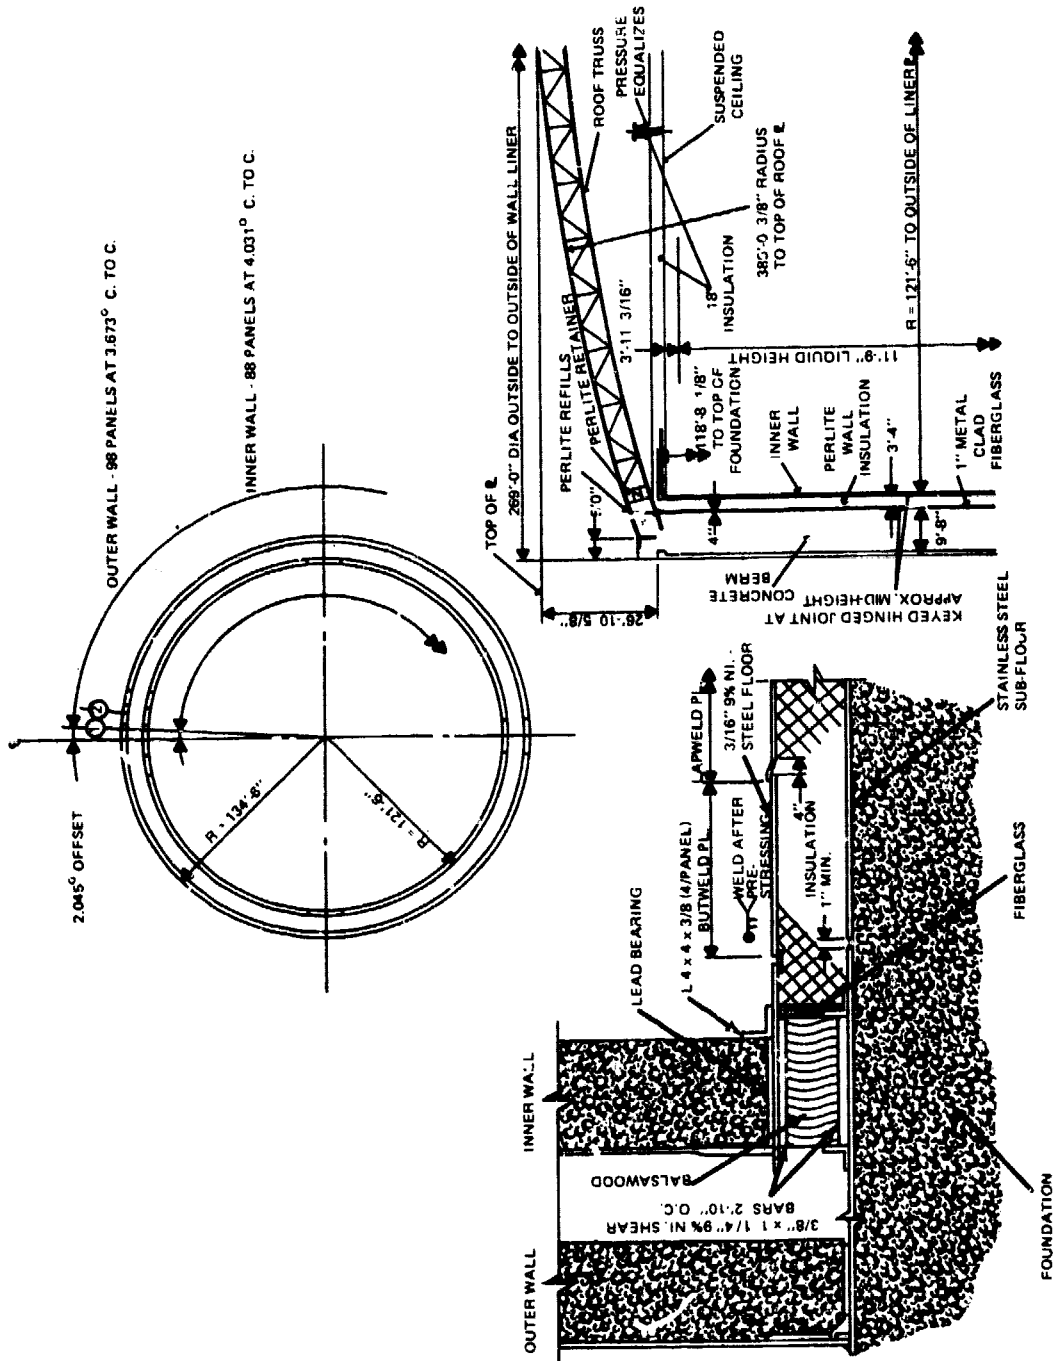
PLAN AND ELEVATION SECTIONS OF THE PUBLIC SERVICE ELECTRIC AND GAS DOUBLE-WALLED PRESTRESSED CONCRETE LNG STORAGE TANK BUILT BY PRELOAD AT ROSSVILLE, STATEN ISLAND, NEW YORK.
